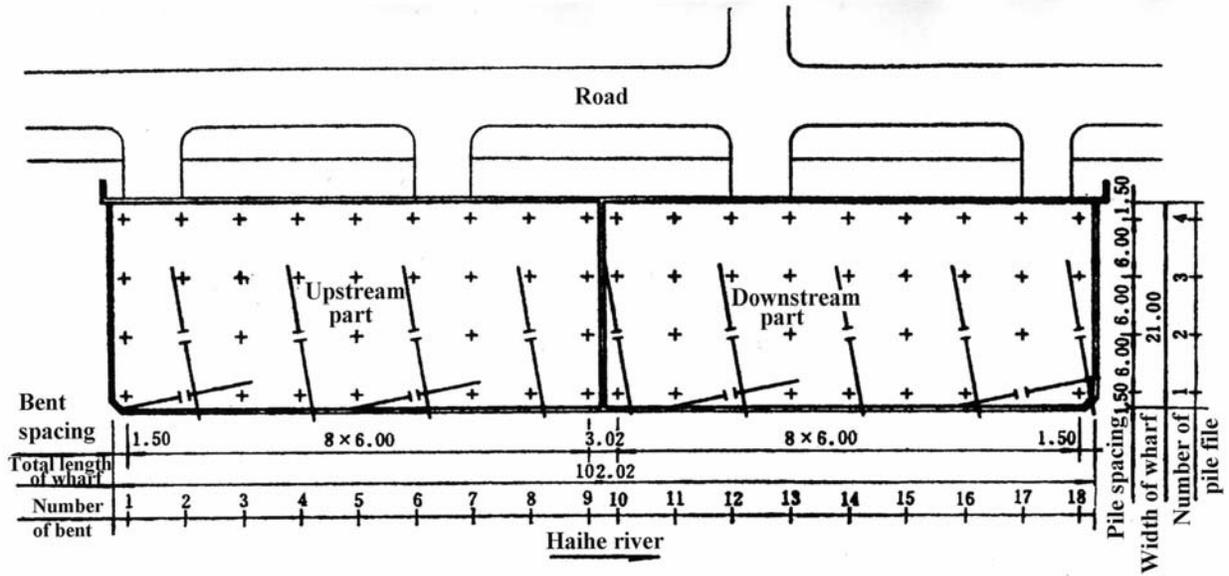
Plan of the Yujiapu foreign trade terminal (in m).
